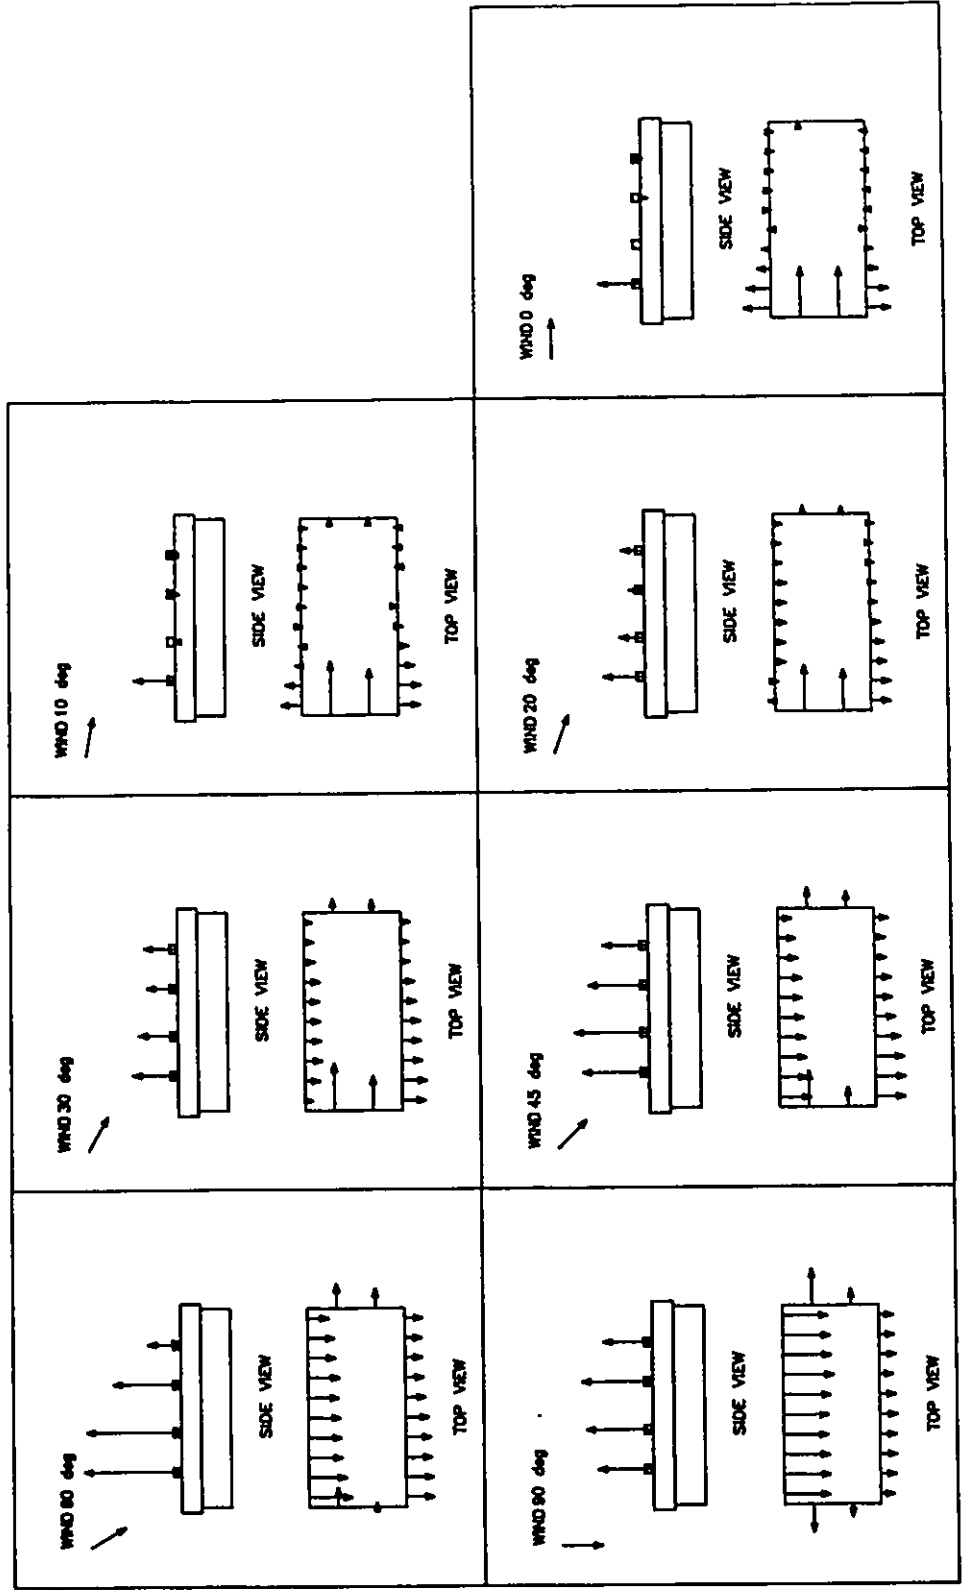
ΔCps (in-out): open model, chimney, simulated 800 mm sidewall openings, open end walls, 7 wind angles of incidence. 407
